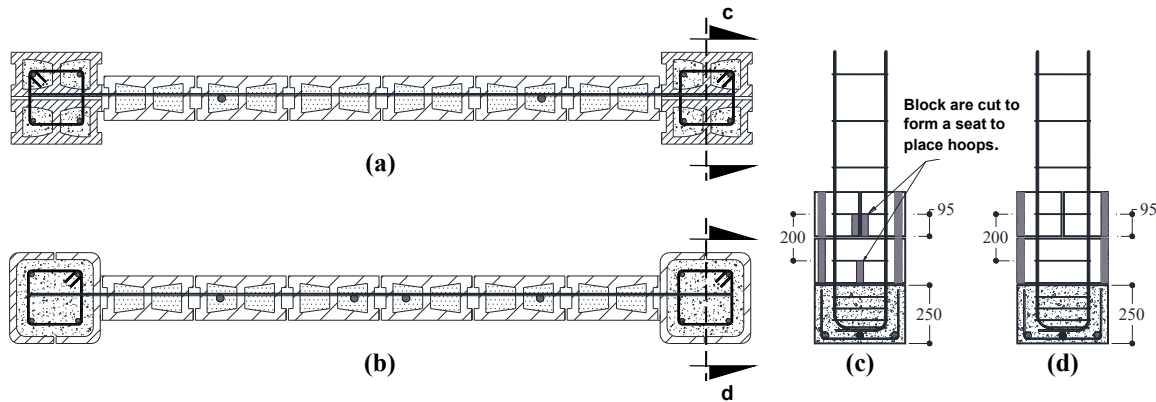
Schematics of a masonry building: (a) Rectangular RM wall; (b) RM wall connected with boundary elements; and (c) RM boundary element
